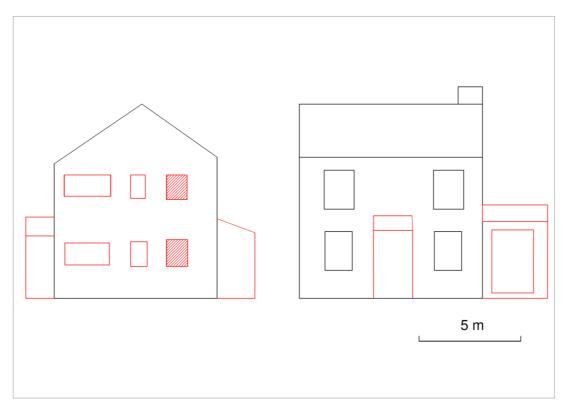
Sketches of the south (left) and east (right) facing elevations, red lines indicate 20th century additions
